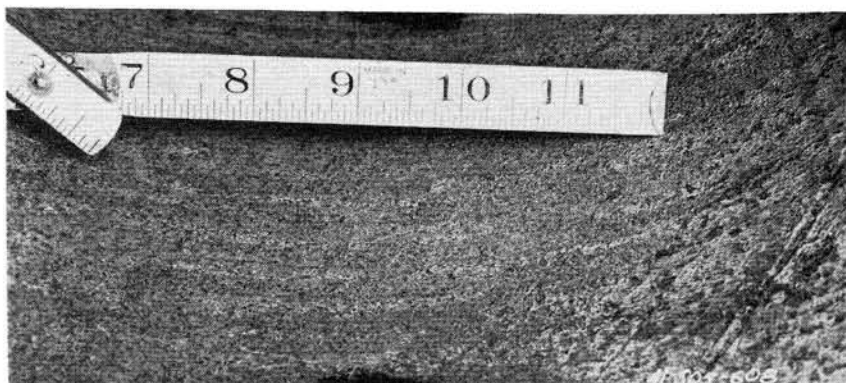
Surface of 18-in. Steel Pipe.
